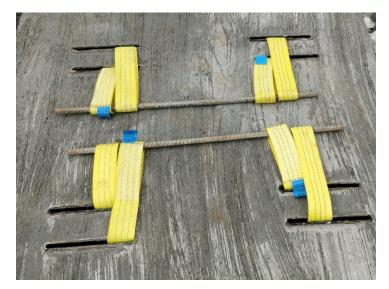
Lifting straps placed through the SC Connector cavity
